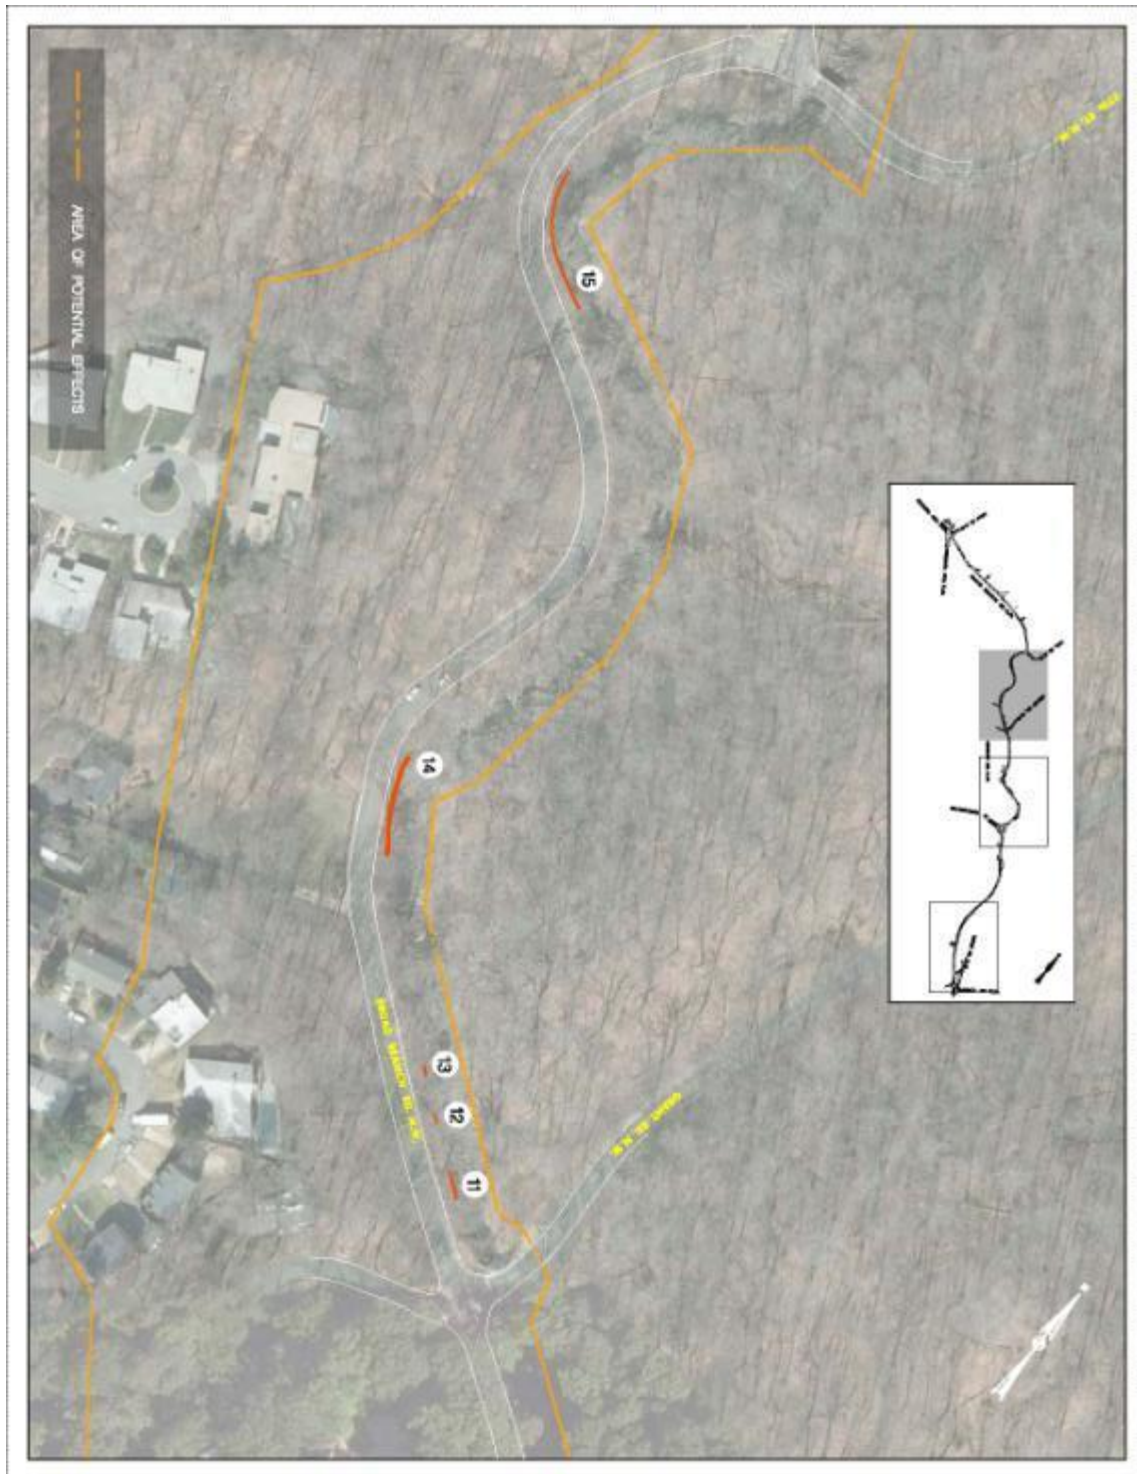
Location of Broad Branch Retaining Wall Segments, Grant Road, NW to 27th Street, NW, Rock Creek Park.
